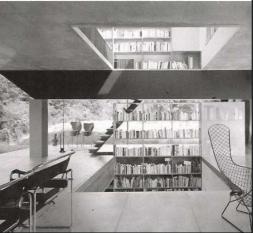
'Maison à Bordeaux' – a house designed specifically for a wheelchair user with many dangerous spots, e.g. missing railings at indoor platform opening and at indoor staircase
